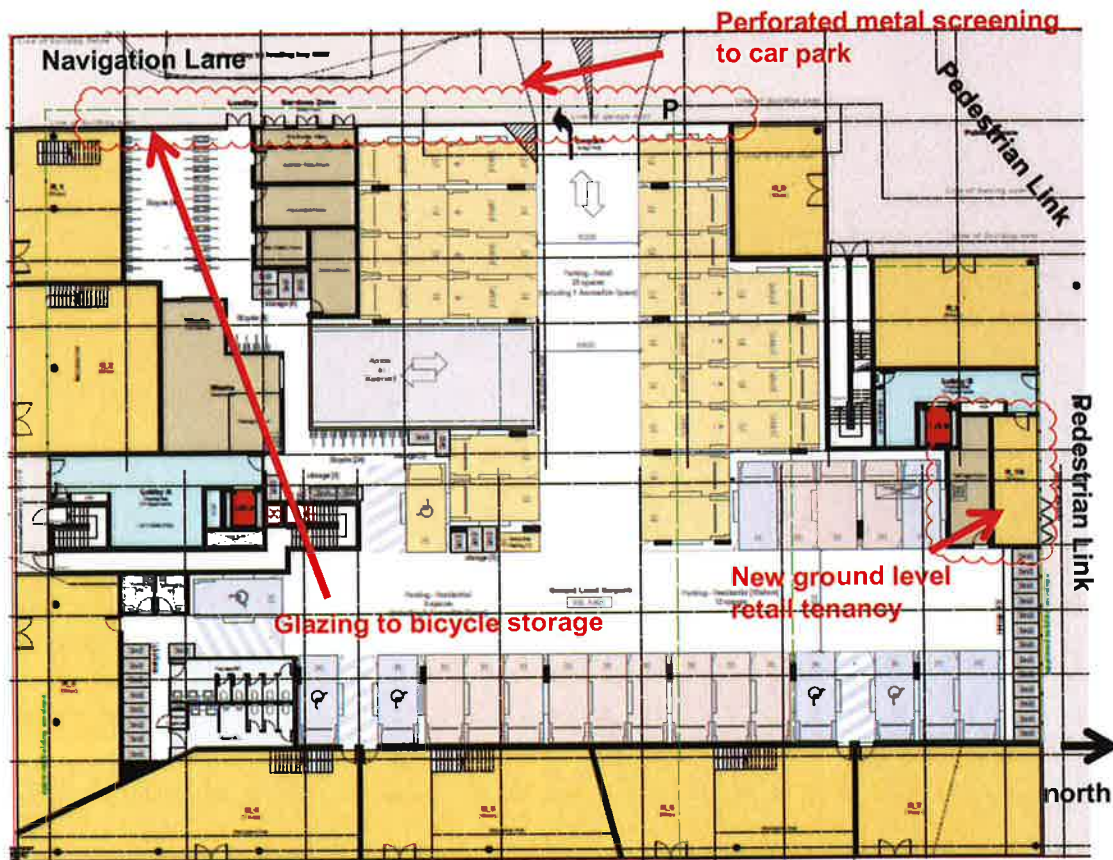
Preferred ground level plan with new screening and retail tenancy.
